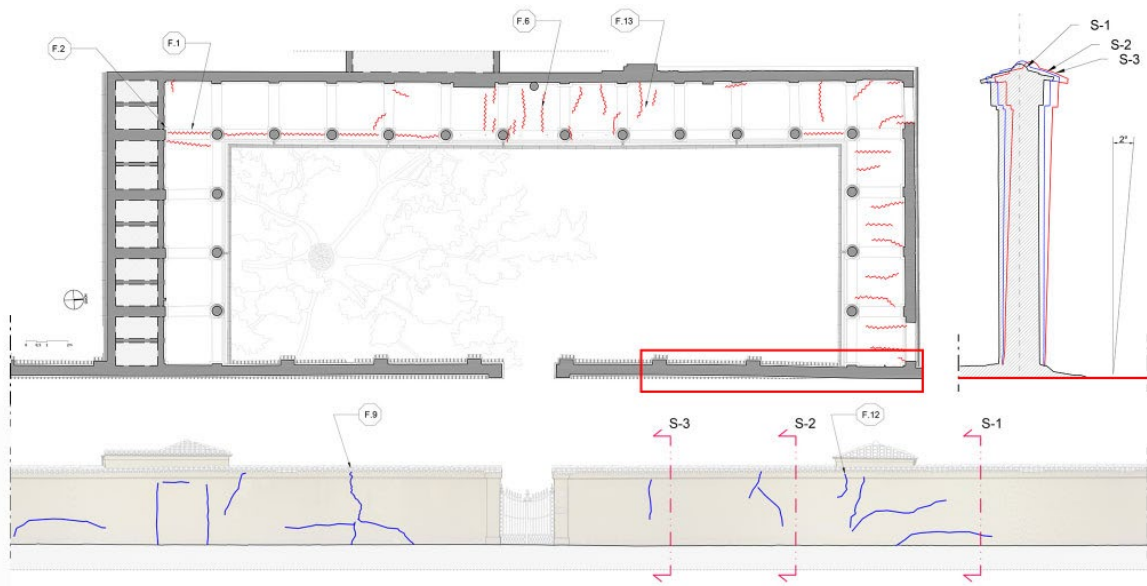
Hypography of the floor plan and foreign elevation with mapped lesions. In detail, masonry torsion with out-of-plumb calculations.
